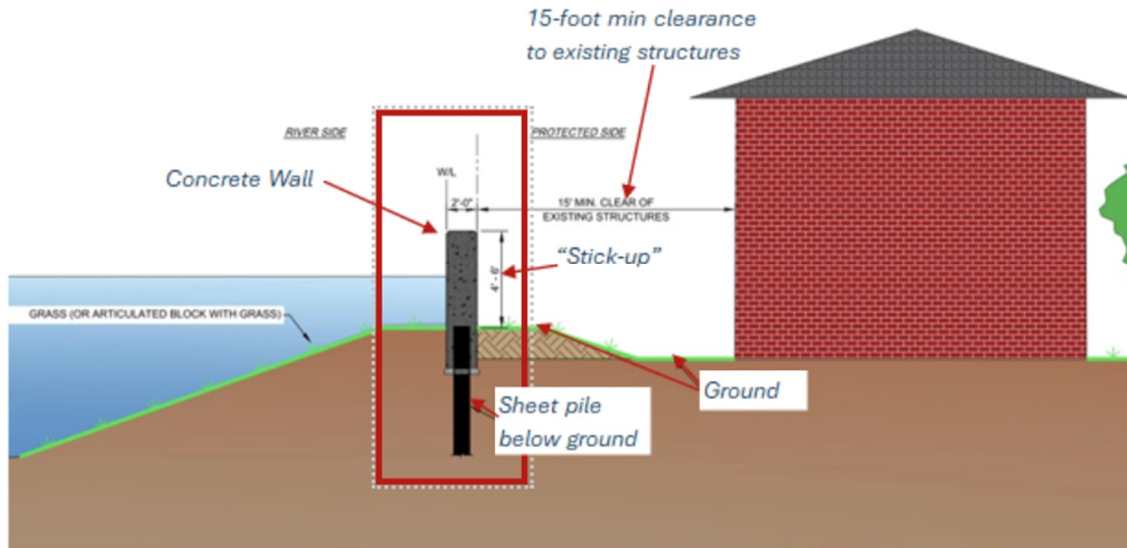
Example I-Wall Cross-Section, Shown Close to Existing Structure
